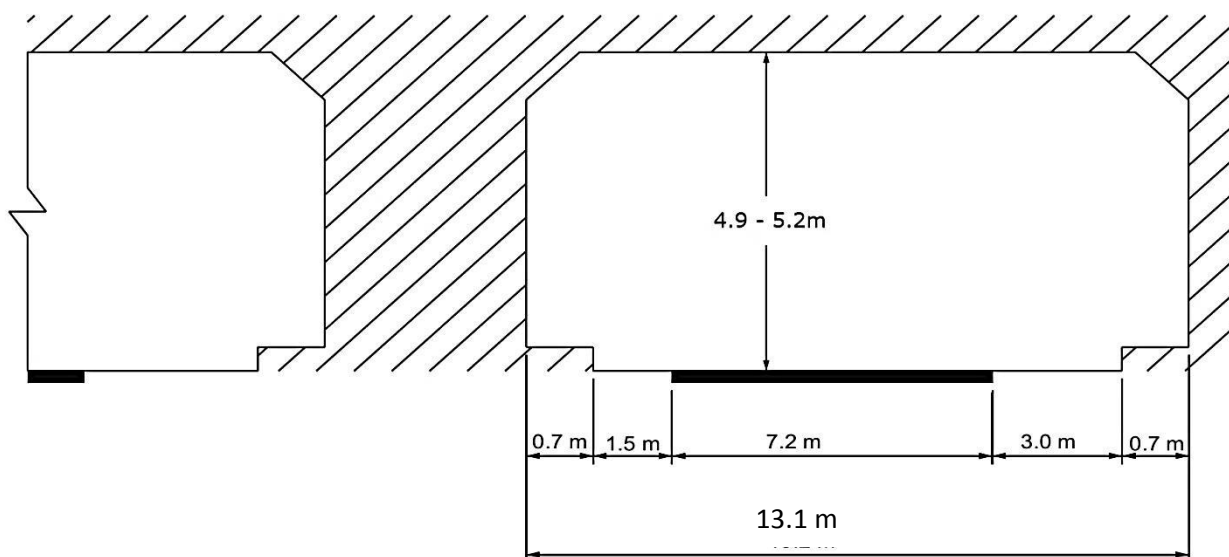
/6: Typical Two-lane Tunnel Section [1, p.4-53]
